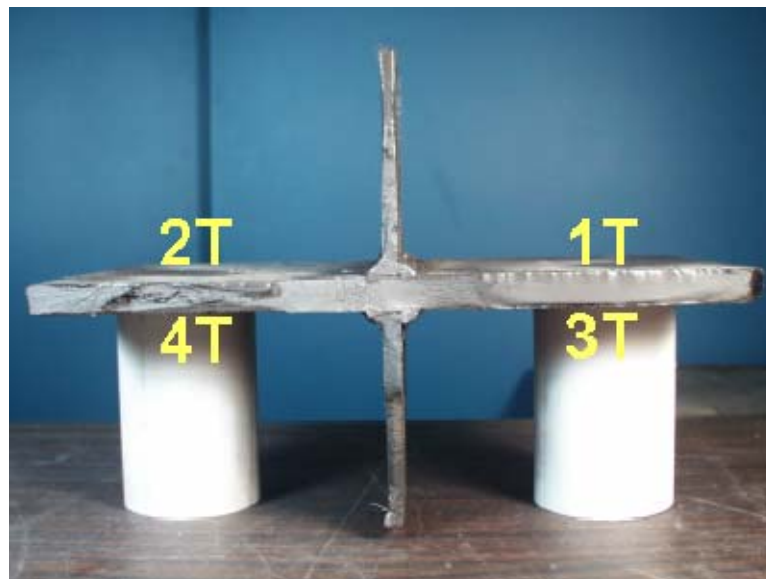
illustrates the fracture surface numbering scheme. A failed specimen is shown in Figure 4-8. Fracture surfaces are labeled according to either the top or bottom grip. Fracture surface 1 is always viewed looking toward the upper grip, and fracture surface 2 is viewed looking toward the bottom grip. All fracture surface photographs in the following sections were taken with the front flange surface (see Figure 4-7) of the specimen facing up.
